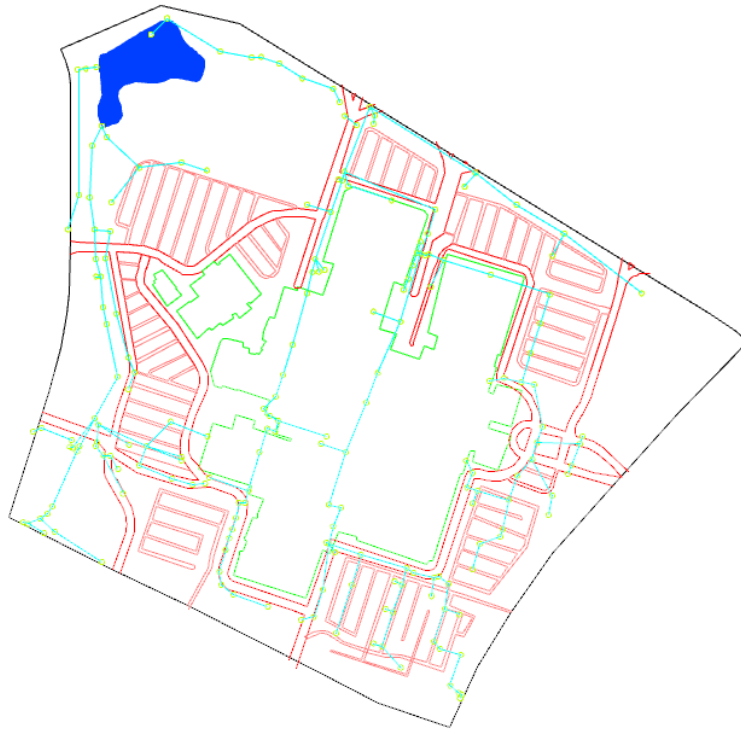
Large site development with sewer pipe outlines, structure outline in middle with parking lots surrounding the structure, and internal roadways connecting external access to parking. With a total lot area of 116 acres, a building size of 26.3 acres, and 2100 parking spots, runoff is routed through a 2.1 acre pond before flowing offsite.
